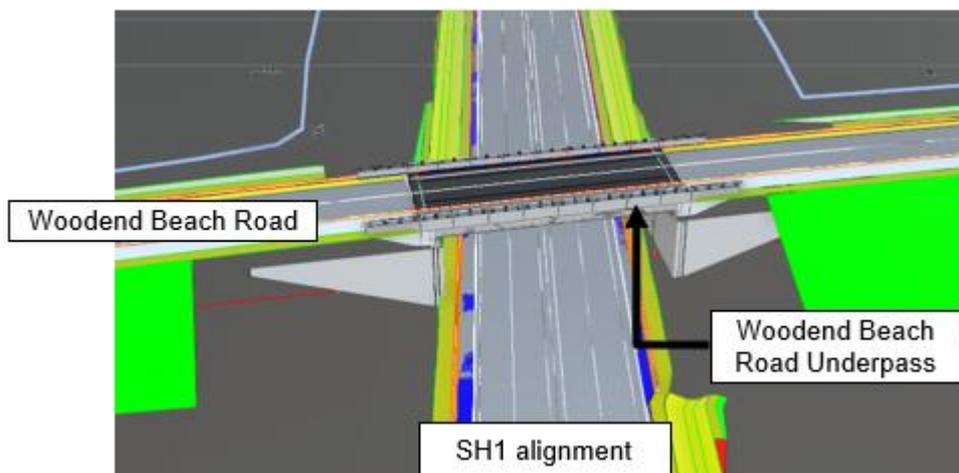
3D Illustration of Woodend Road Underpass
